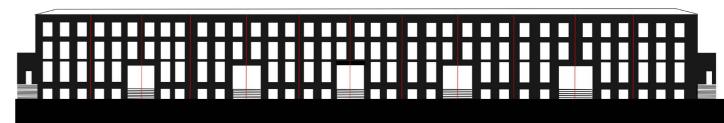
Architectural style Quinsborough Road echoed within the proposed scheme. View north from Nuns Walk / County
